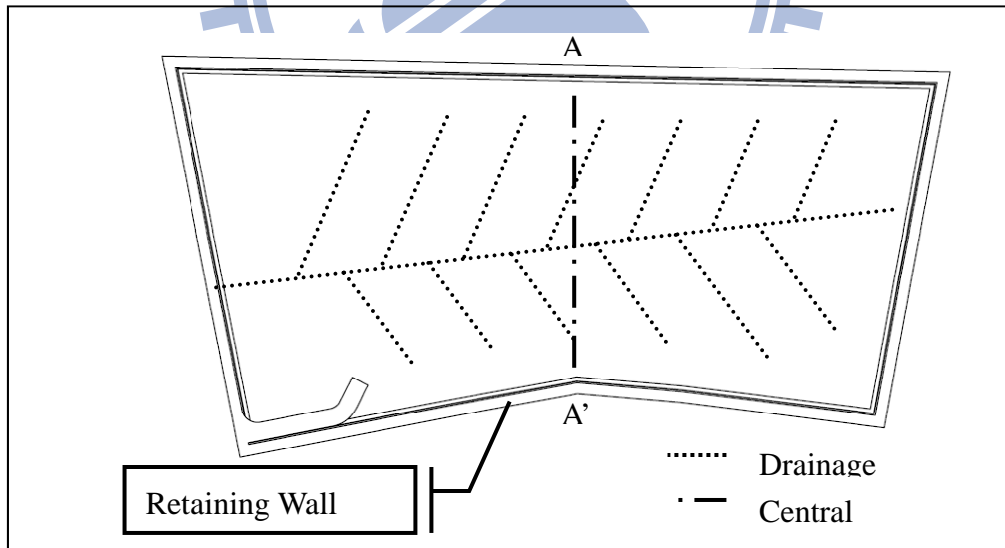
Anding Landfill from Plan View, Modified from the Original Drawing
